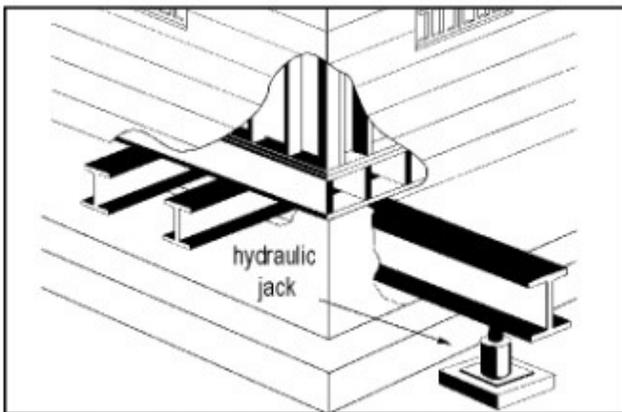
I-beams are placed under lift points perpendicular to floor joists with a second set beneath for uniform lifting.
